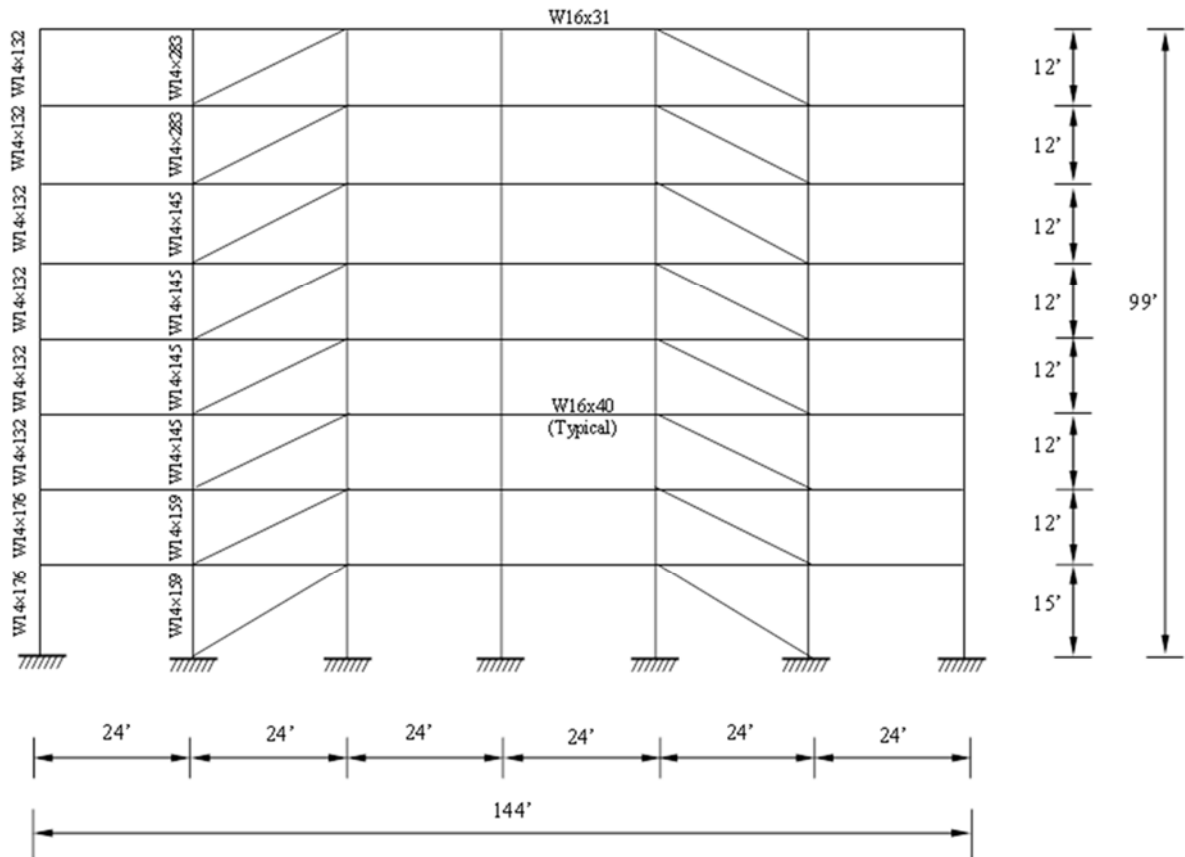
Eight Story Bare Steel Frame Elevation
